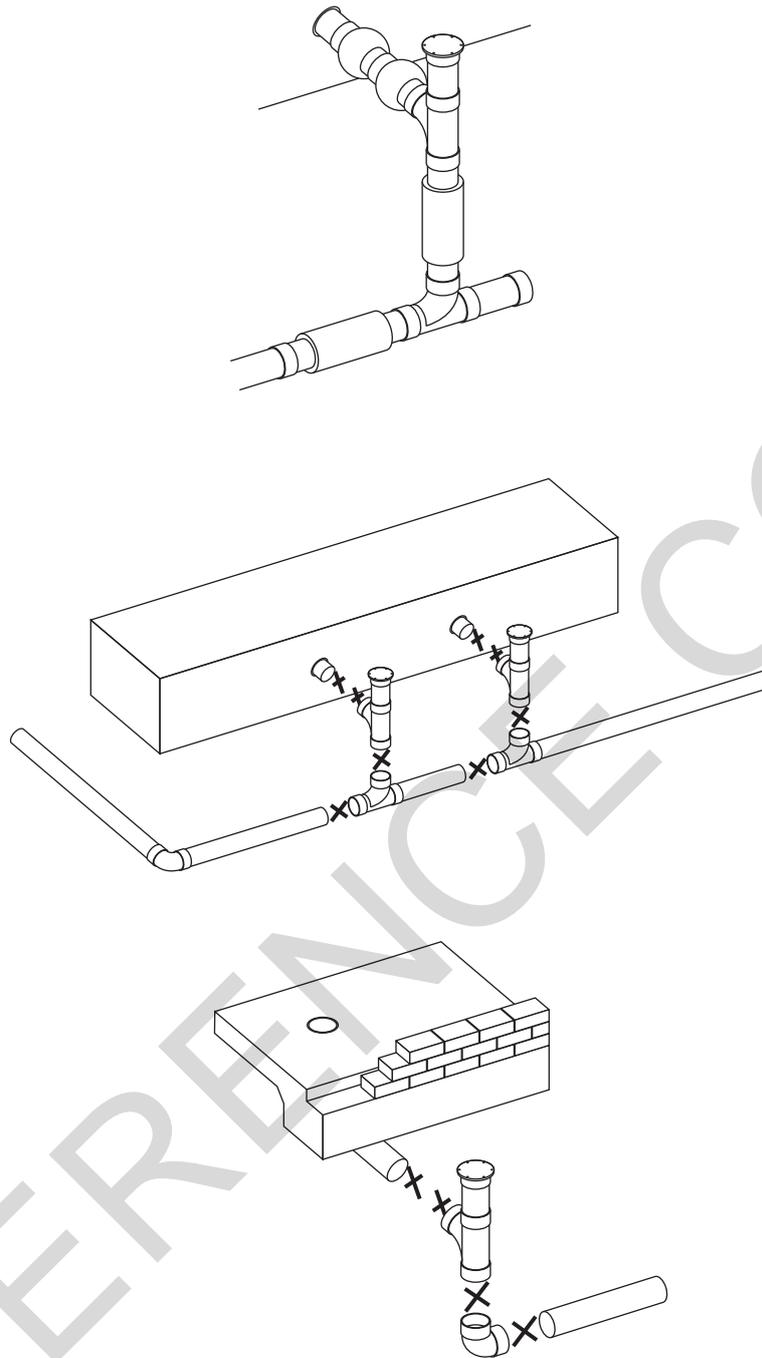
TYPICAL VERTICAL RISERS
